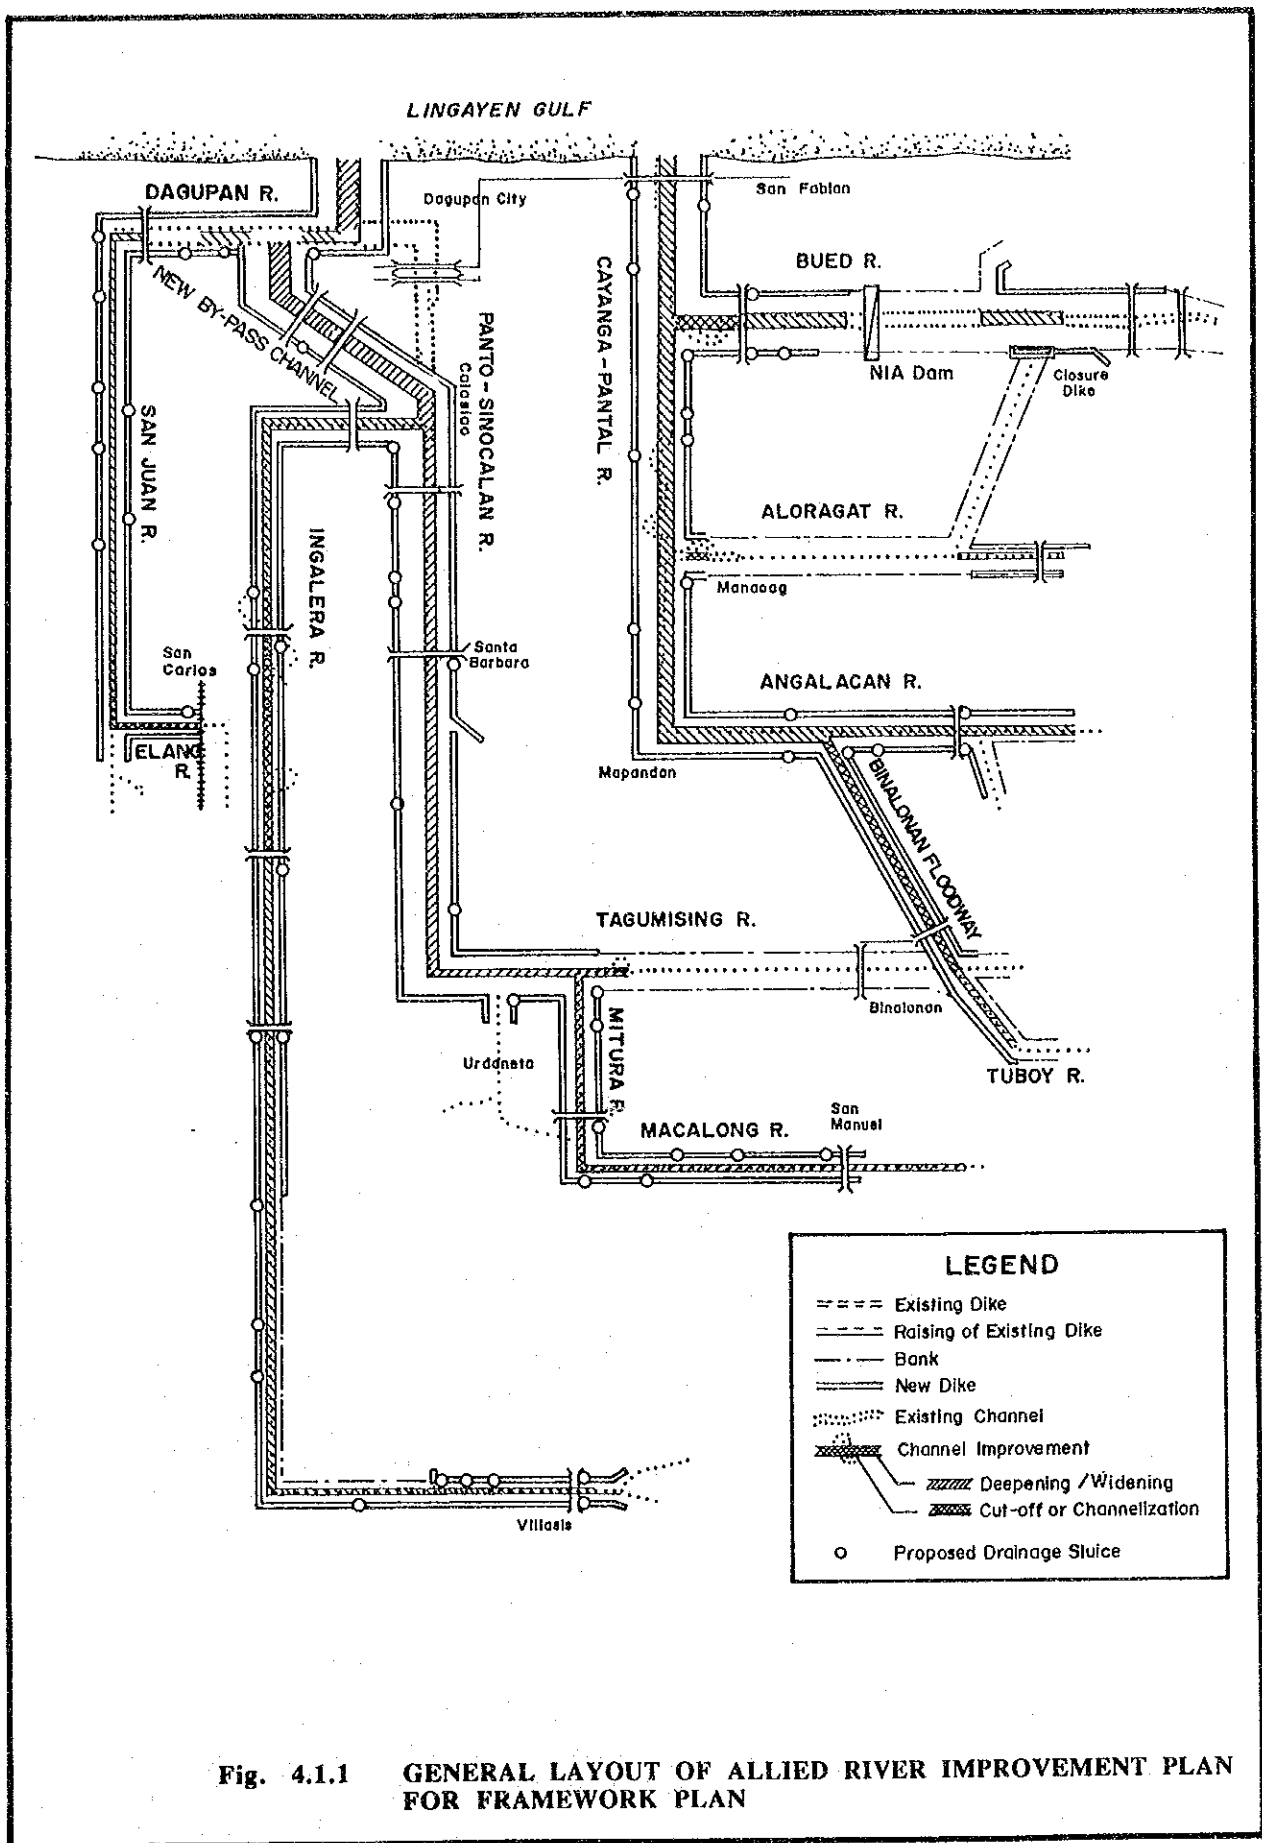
GENERAL LAYOUT OF ALLIED RIVER IMPROVEMENT PLAN FOR FRAMEWORK PLAN
